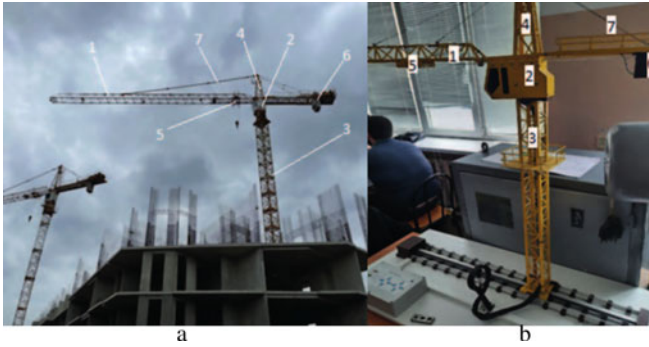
Tower crane: a—real object; b—full-scale model. Legend: 1—arrow; 2 control cabin; 3—tower; 4—head; 5—cargo trolley; 6—counterweight; 7—thrust
